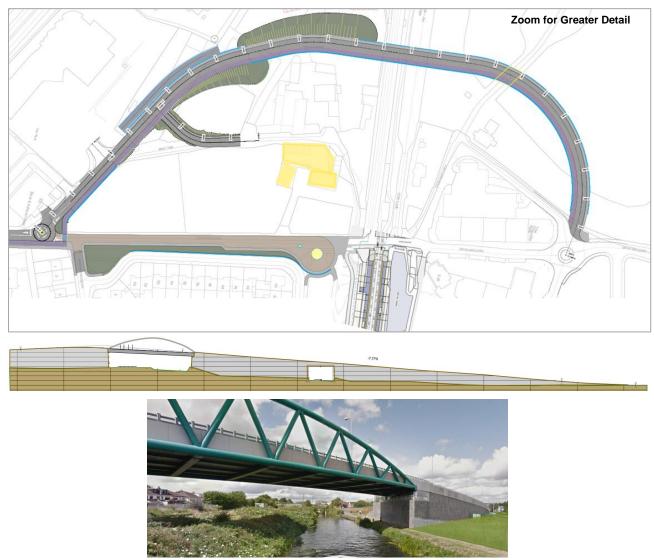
Ashtown Option 13 Canal & Railway Overbridge West of Mill with Access Enhancements at Station
